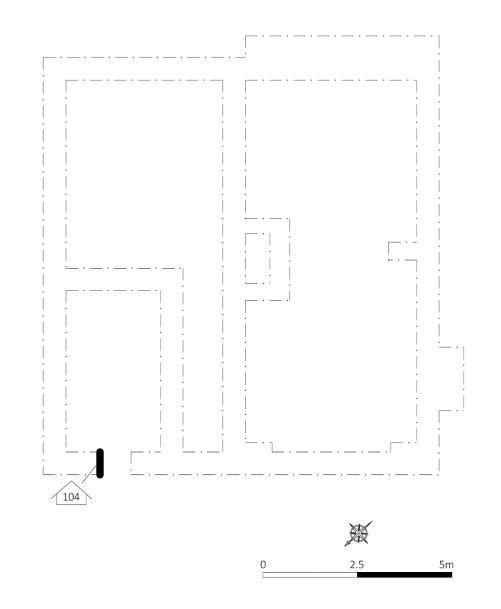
Plan of Plot 1, indicating location of stone wall [104] (scale 1:100)
